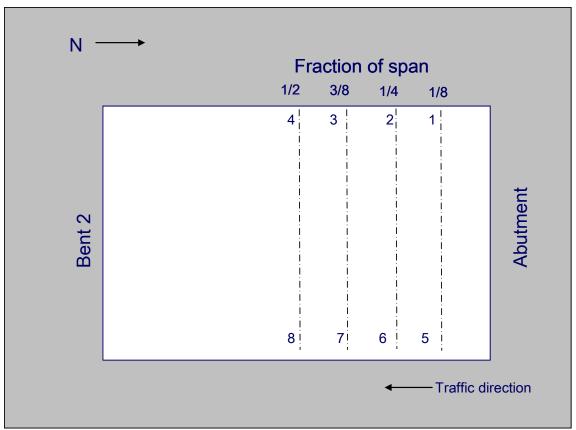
Instrument Location Site 3: Loop 1 at Barton Creek
